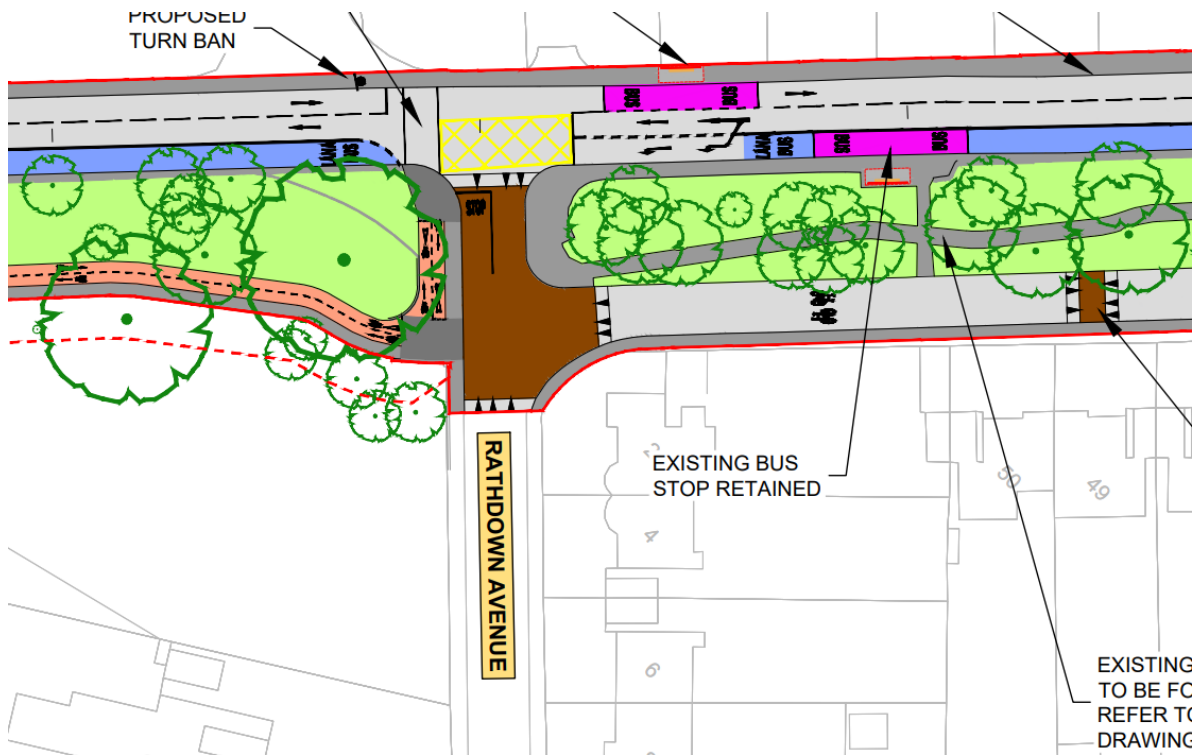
Extract from General Arrangement drawings showing layout at Rathdown Avenue
